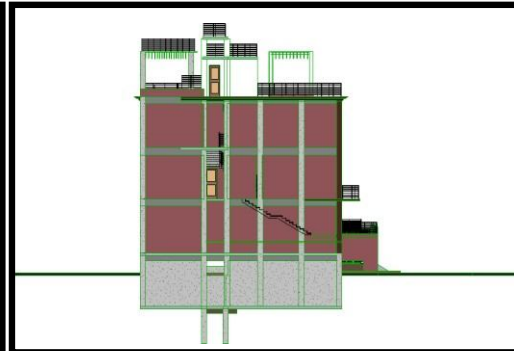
(i) 3-d view corner elevation Fig-5(ii) 3-d view side elevation
